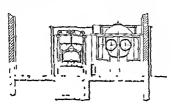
FIG IT GRASS COMBINED DESTRUCTOR AND ELECTRICITY WORKS Sectional Elevation
